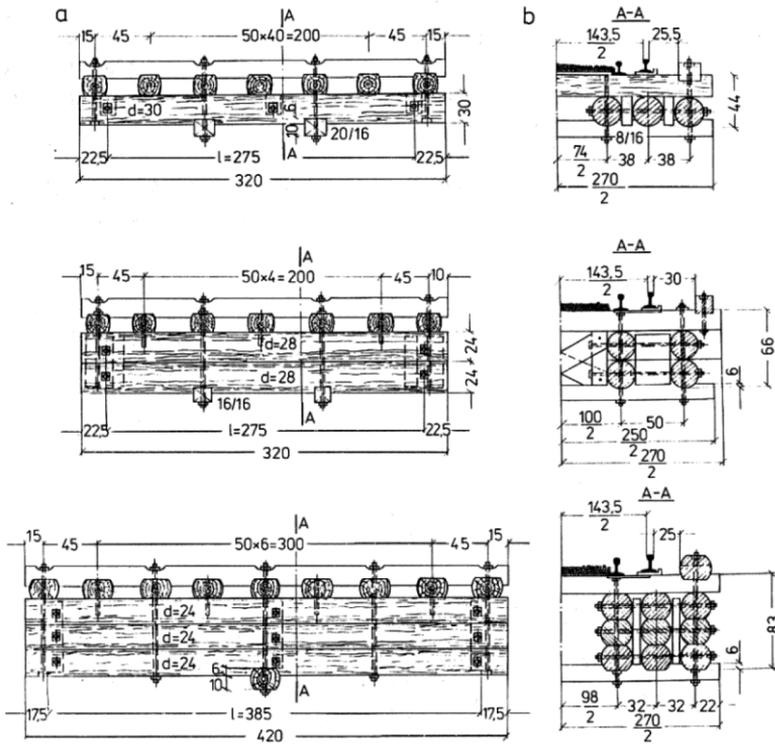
Wooden spans of temporary bridges with main girders composed of so-called multiple beams (Cholewo & Szurowski, 1970; Miklin & Sawicki, 1993): a - longitudinal view, b - cross sections through a main girder composed of three, four and nine beams
